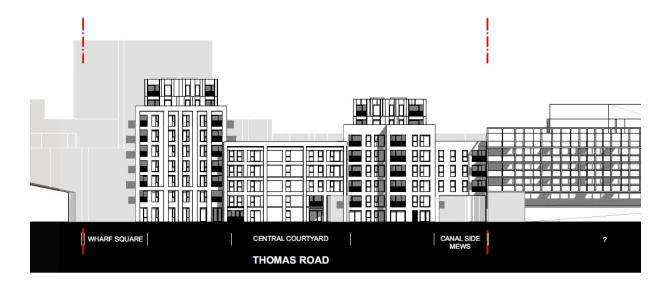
Thomas Road elevation (Burdett Wharf to the right)
